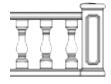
Noble1 Binelli2 Verona2 Balustrade with Matching Newel Pier
